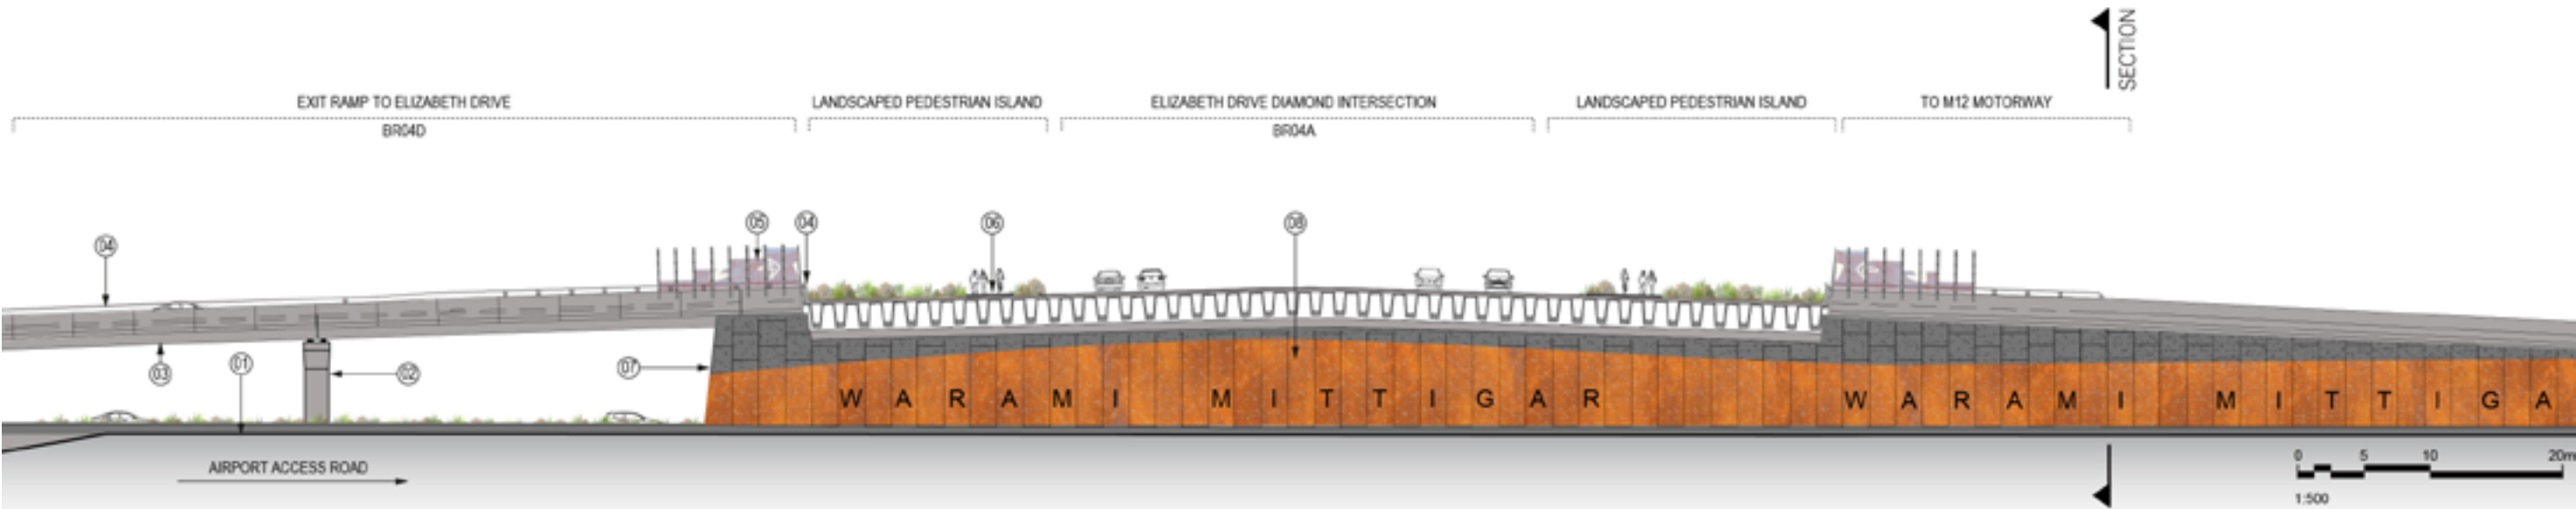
Elevation - BR04A - Bridge over Airport Access Road on Elizabeth Drive
